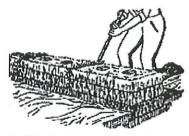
Constructing a straw bale barier to slow runoff and prevent erosion.
